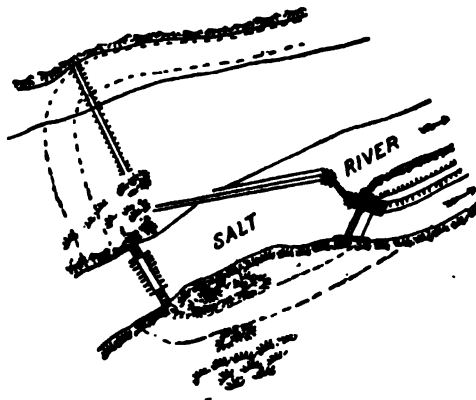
Old Arizona Canal. Plan of Headworks.
